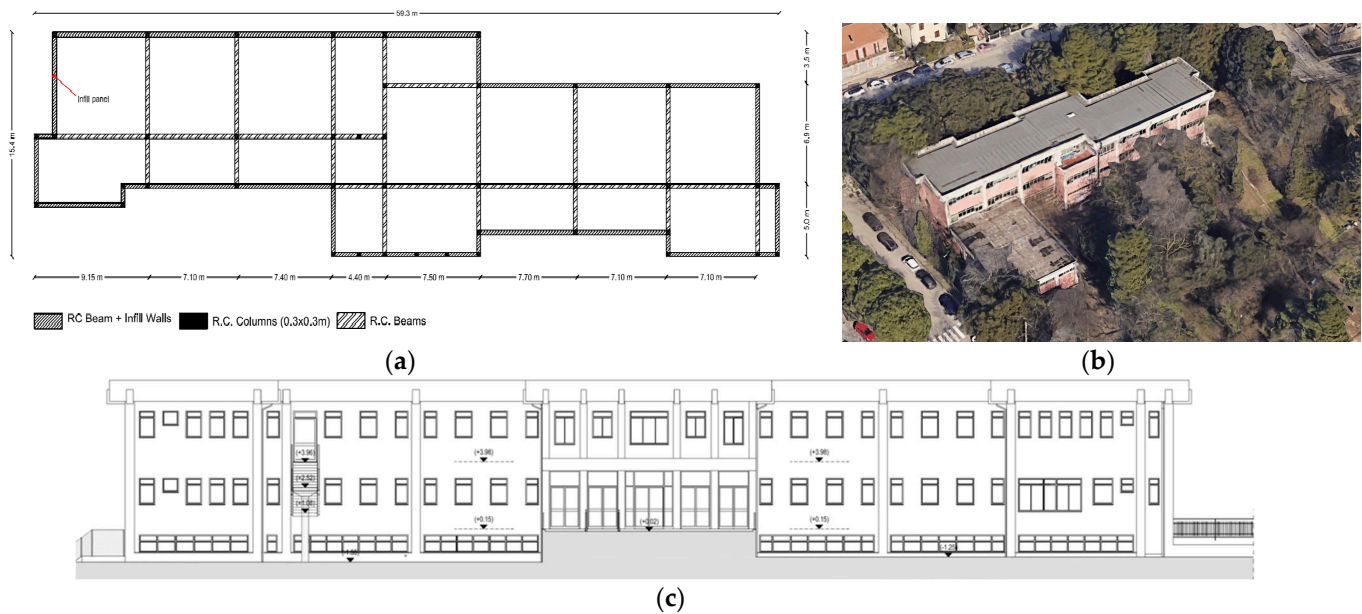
Case-study school building: (a) plan layout, (b) satellite view (Google Earth), and (c) longitudinal elevation.
